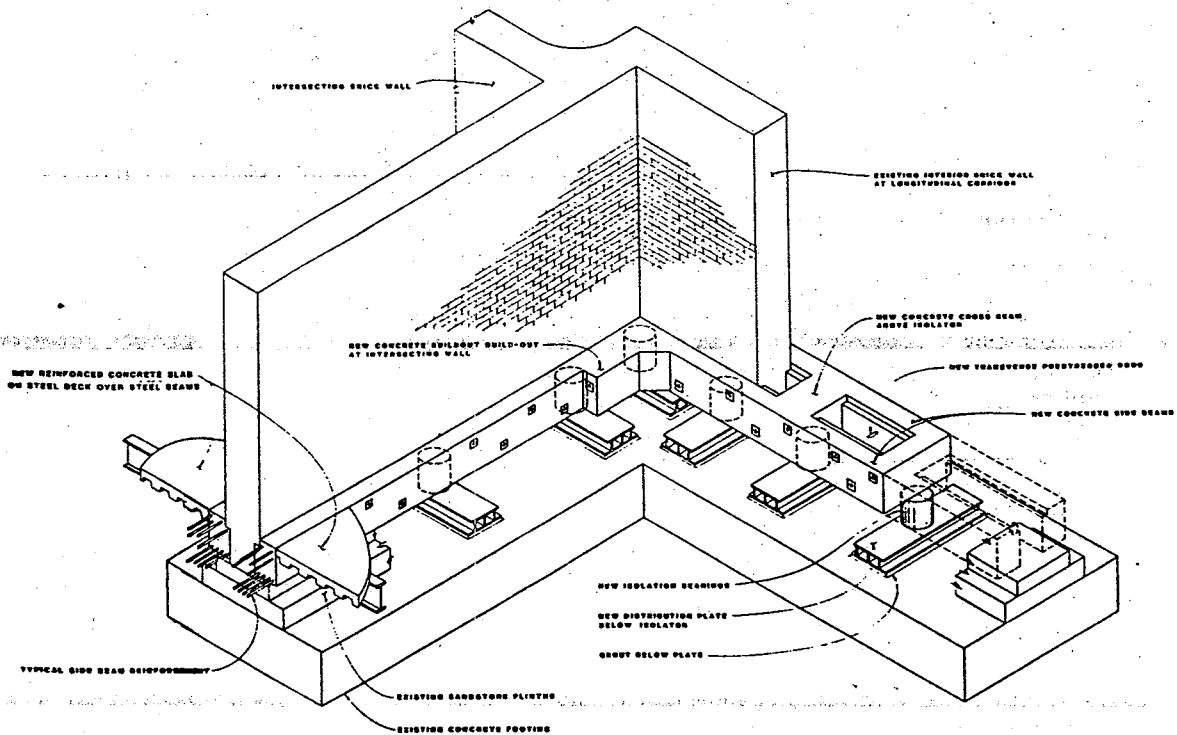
Isometric cutaway of typical wall intersection sharing existing foundations and masonry walls and the new cinch beams and spreader beams as well as the base isolators.
